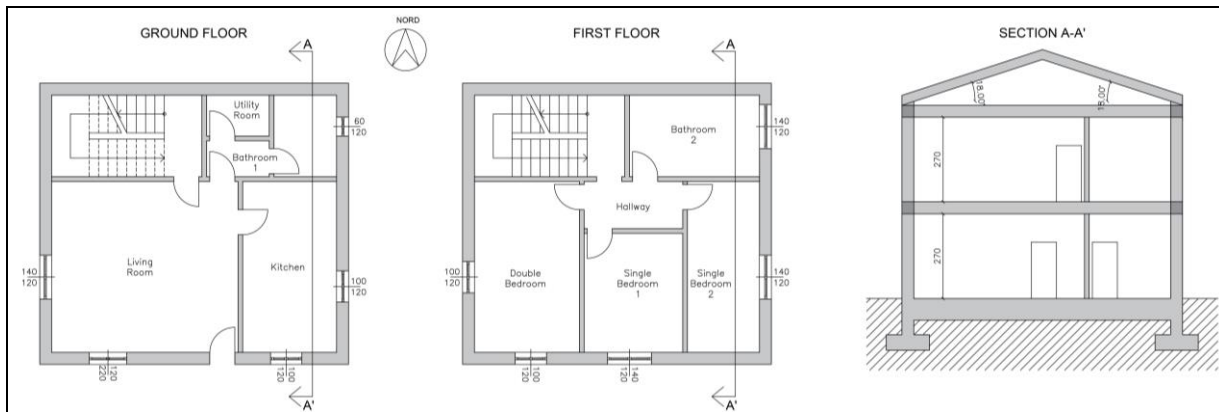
Plan view of the ground floor, first floor and section of the case study
